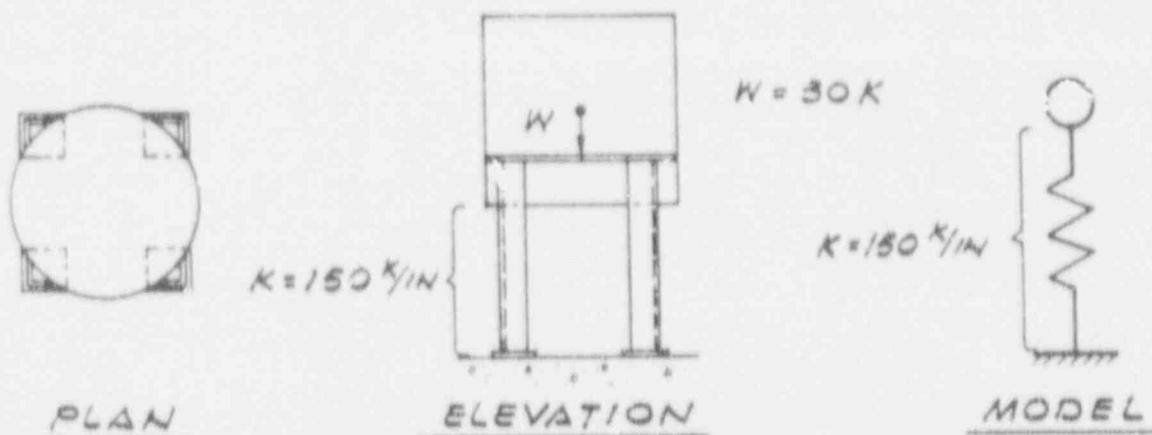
EQUIPMENT SUPPORTED ON RIGID BEAM OR SLAB
